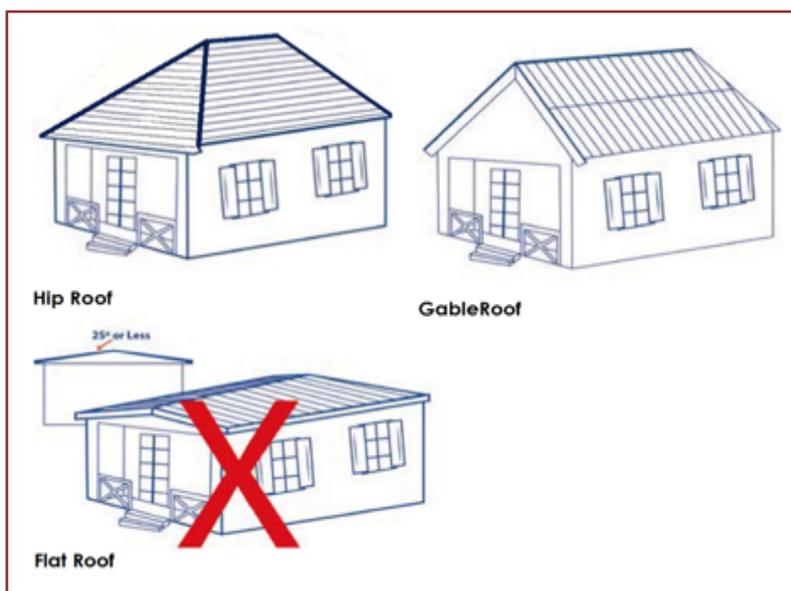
Typical roof shapes (Source: Fiji Rural Housing Unit standard drawings)
